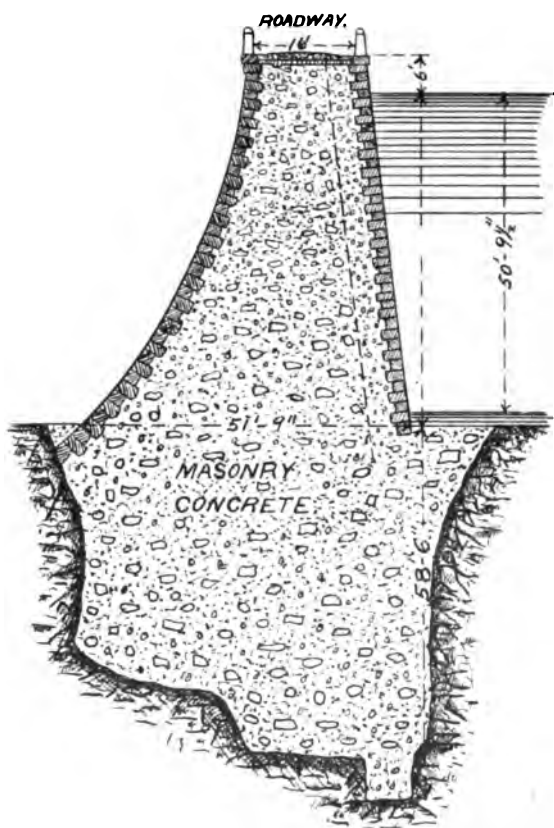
SECTION OF LAKE THURLMERE DAM—SHOWING METHOD OF CONSTRUCTING FOUNDATION..
